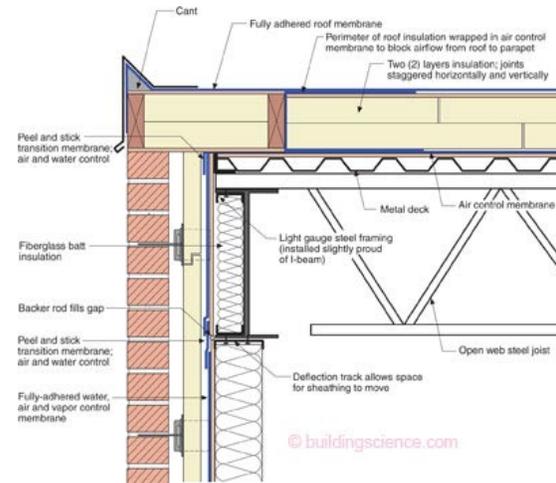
The Cantilevered Mini Parapet—Notice that air control layer continuity is achieved by wrapping the membrane over the building corner and then constructing the cantilevered portion of the parapet over the top of this air seal.
